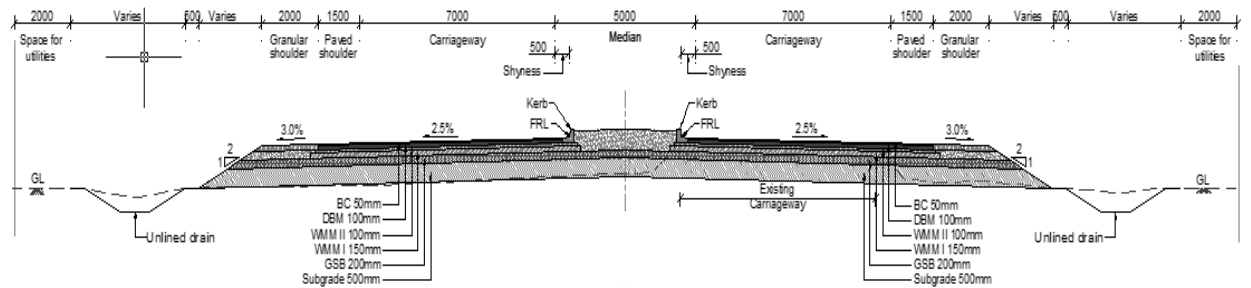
TCS 1A.3- 4 Lane Rural Area (Left Side Existing Road)
